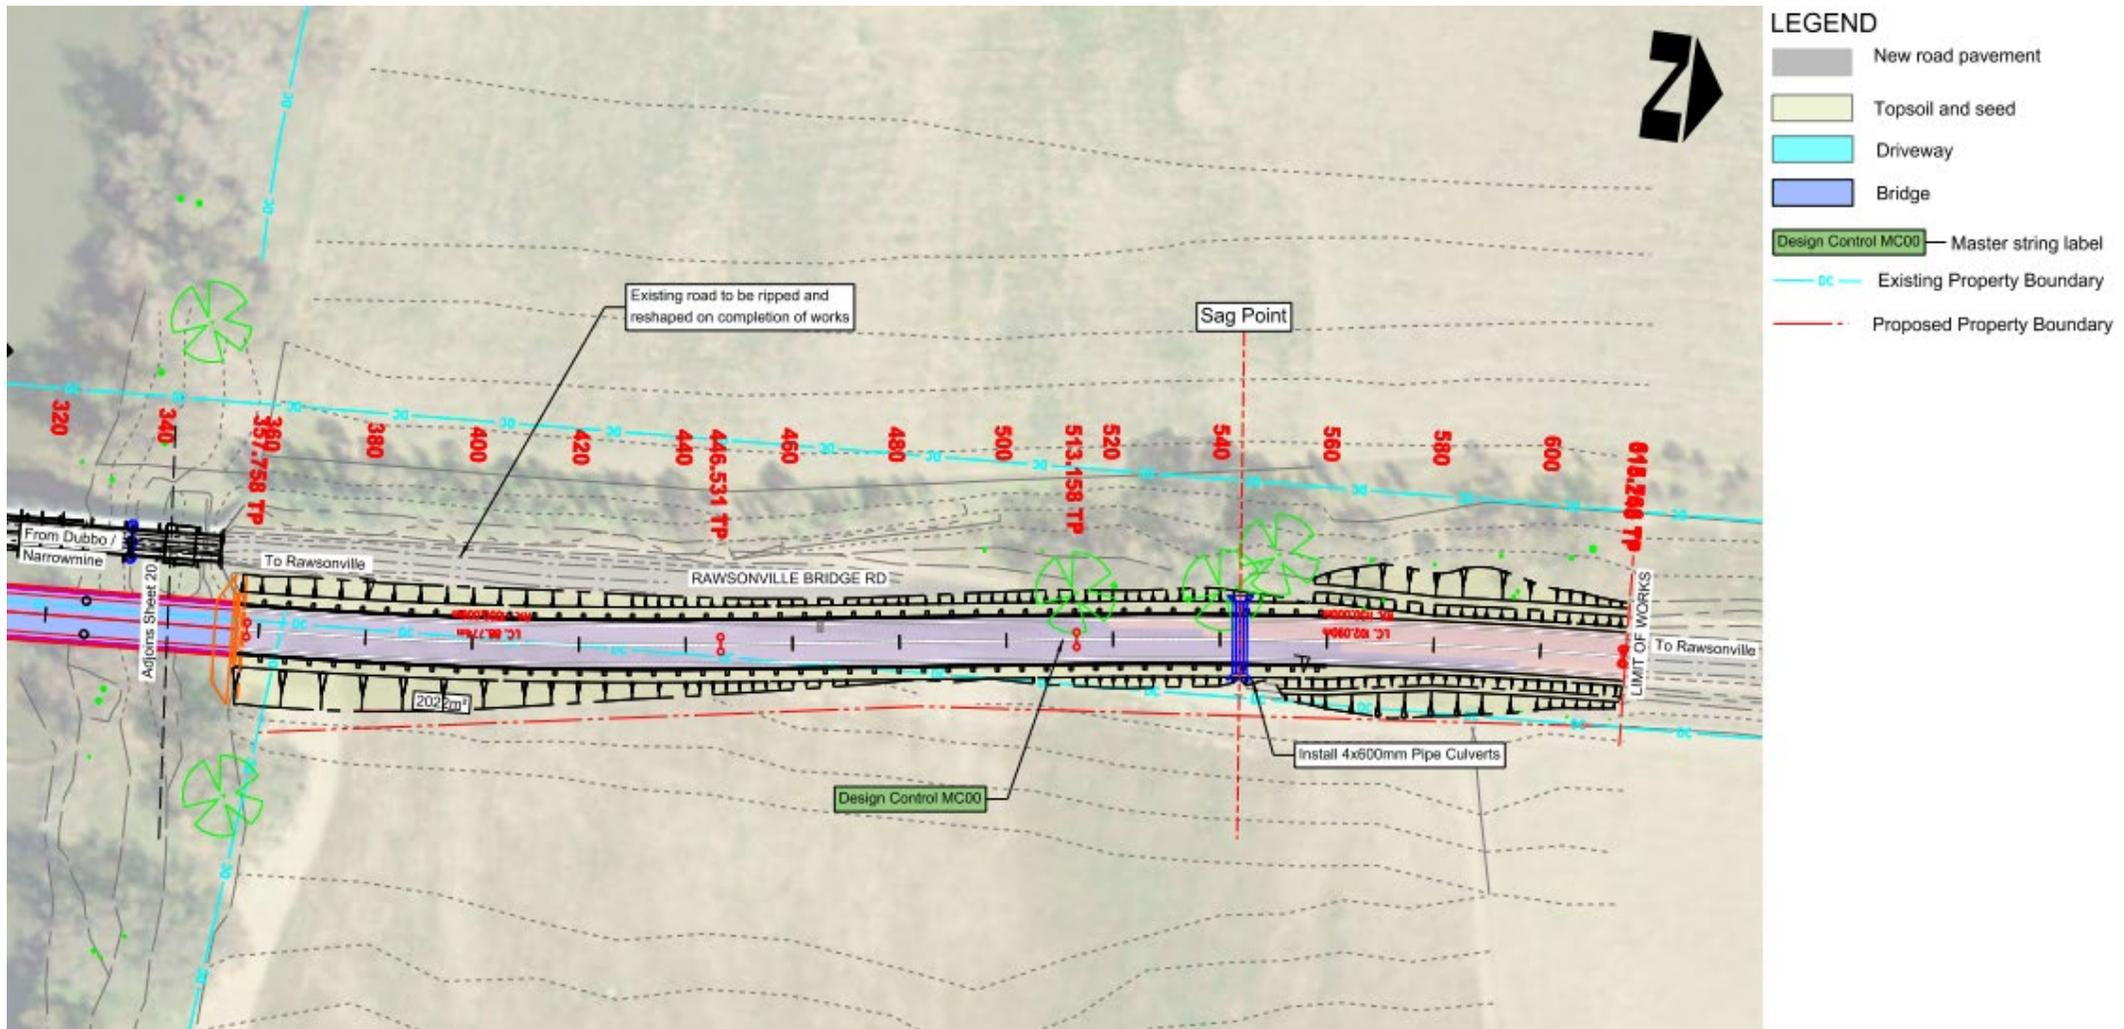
New bridge northern approach. Source: CCHD (final design)
